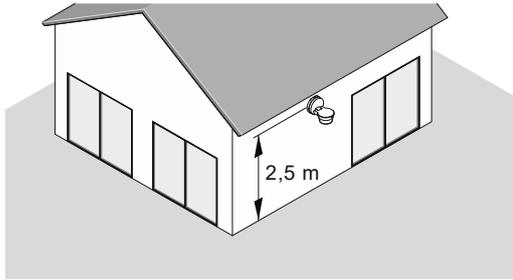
Wall mounting on free-standing one-family house 6851/22-xxx
